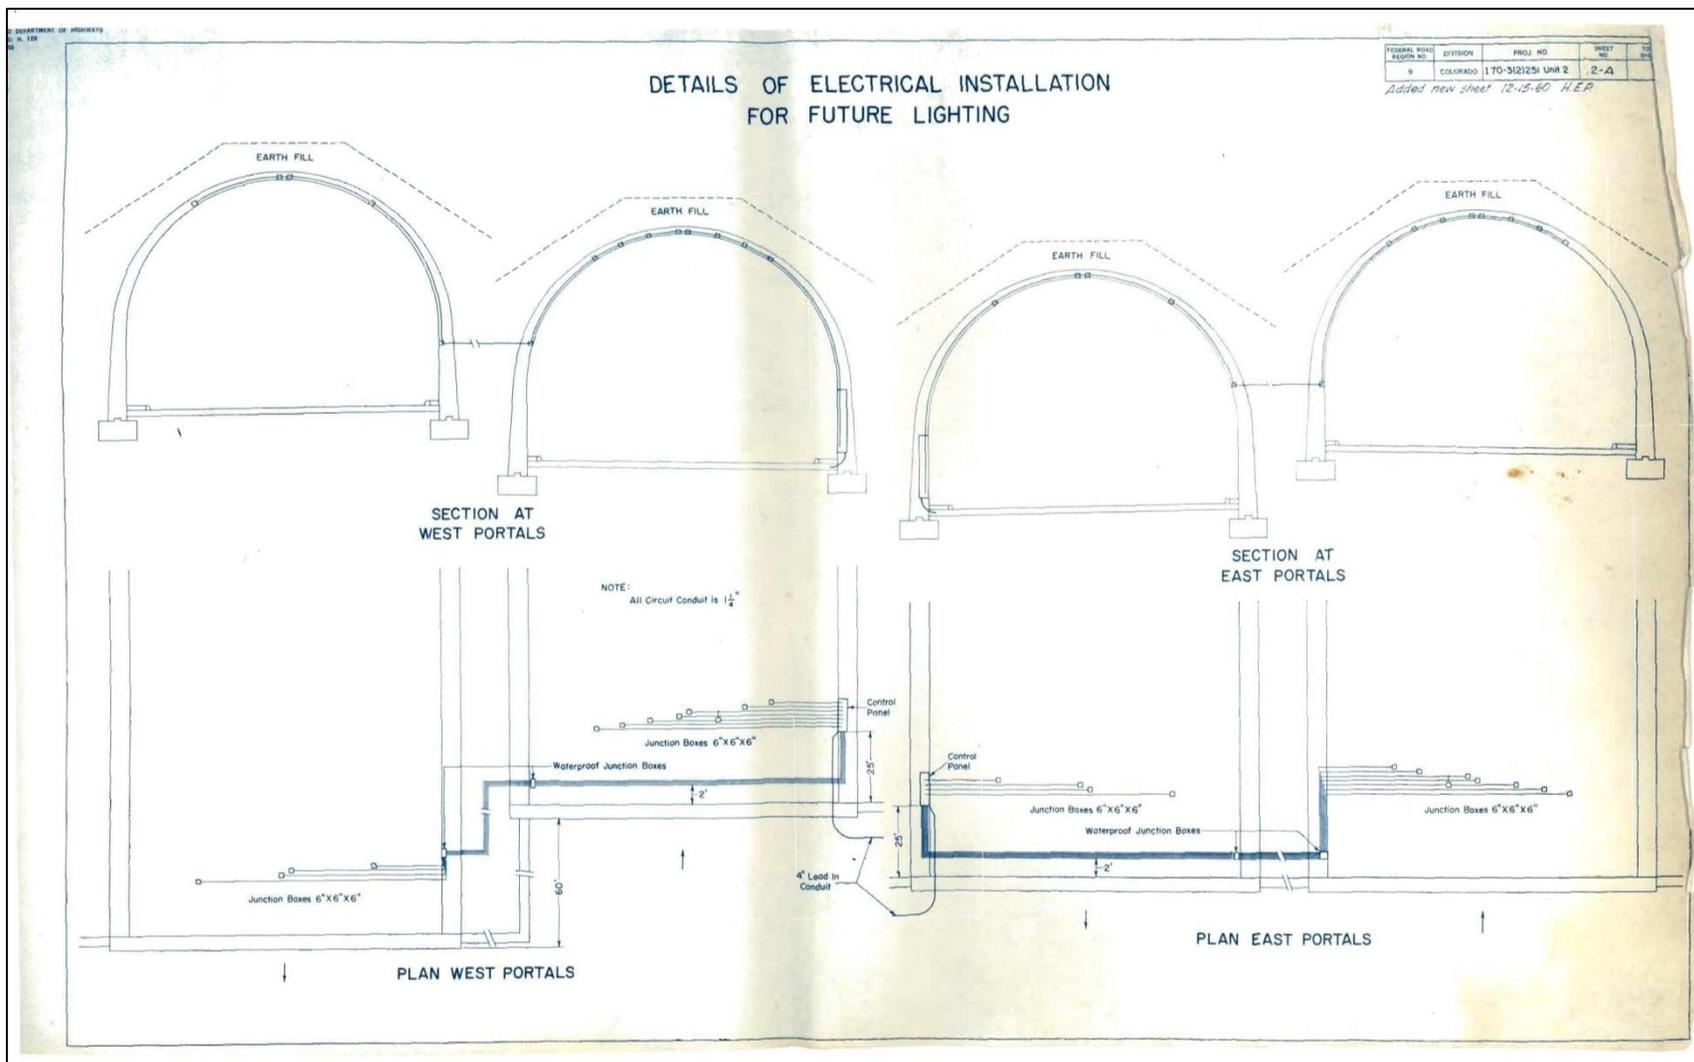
Twin Tunnels As Built Plans (Sheet 2-A). Electrical installation details at portal entrances.
